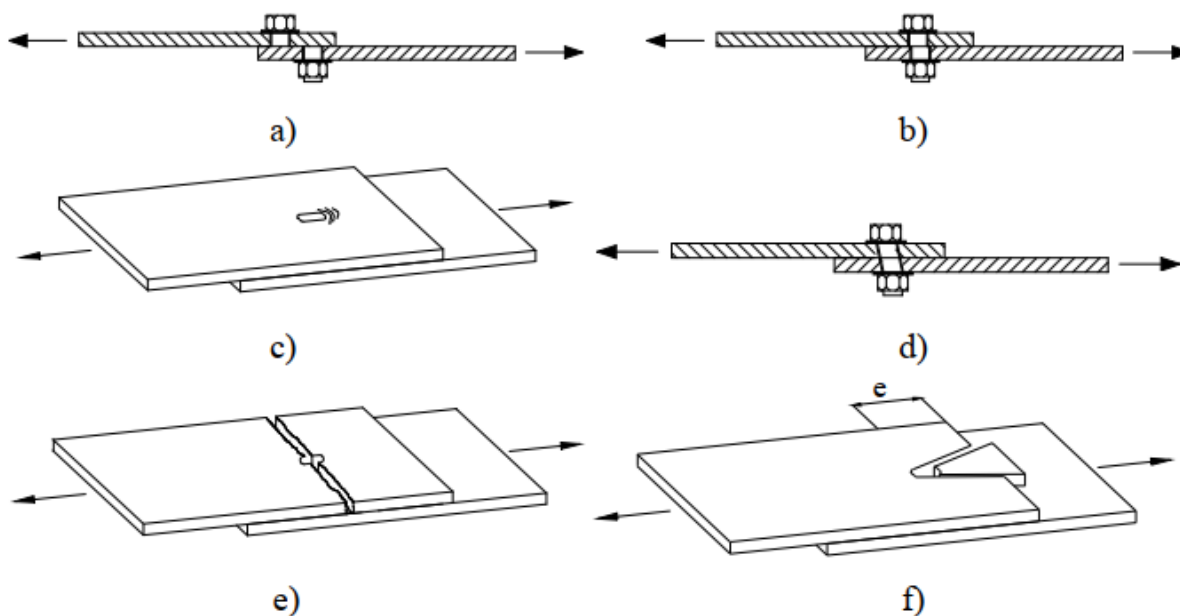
Failure modes of bolted connections in shear (Dubina et al., 2013).
